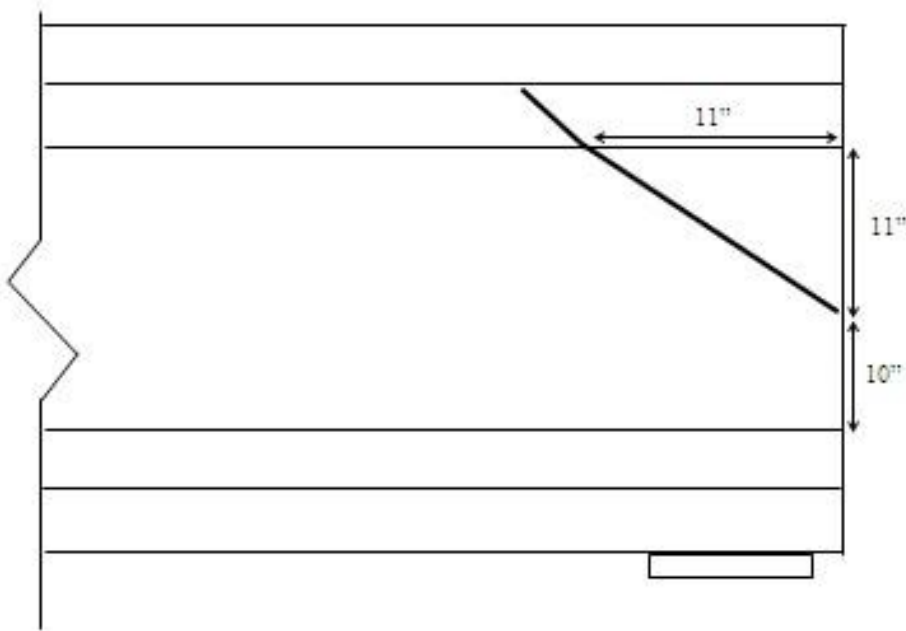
Crack diagram for south span, exterior girder, east side, interior face, south abutment (#7933).
